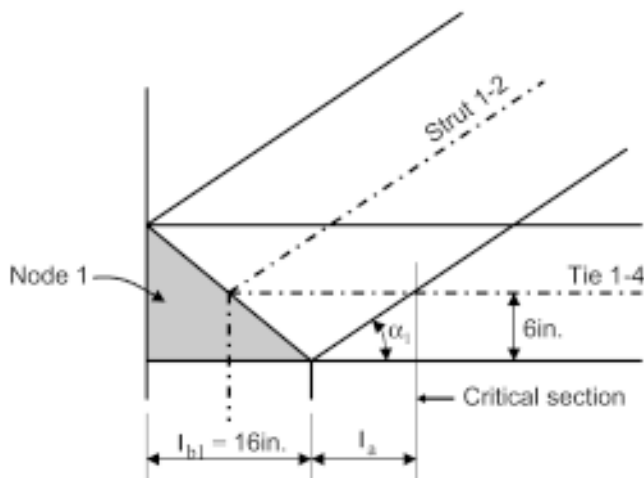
Location of critical section for anchorage of reinforcement in Node 1 (1 in. = 25.4 mm)
